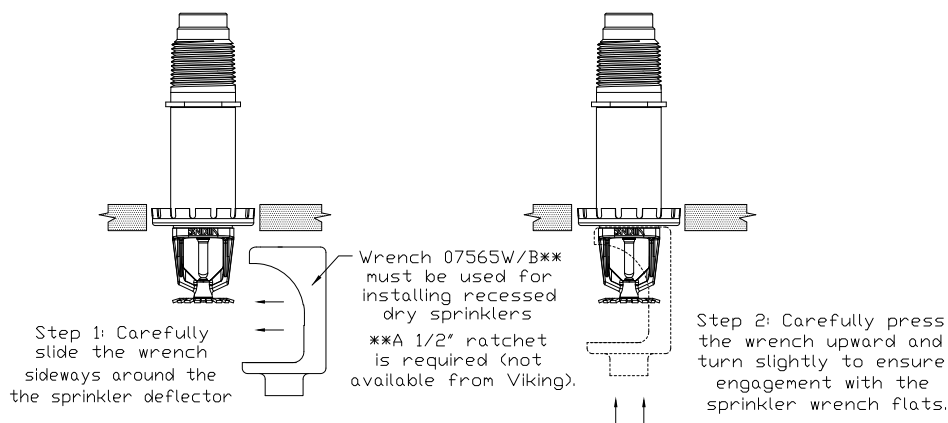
Wrench 07565W/B for Adjustable Recessed Dry Pendent Sprinklers
